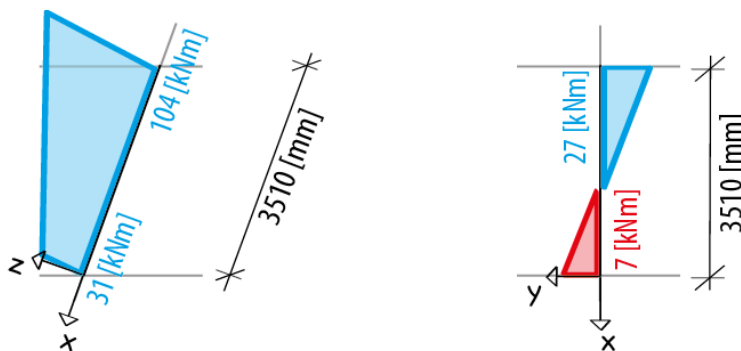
Moment line at ground floor column part 2 (local coordinate system)
